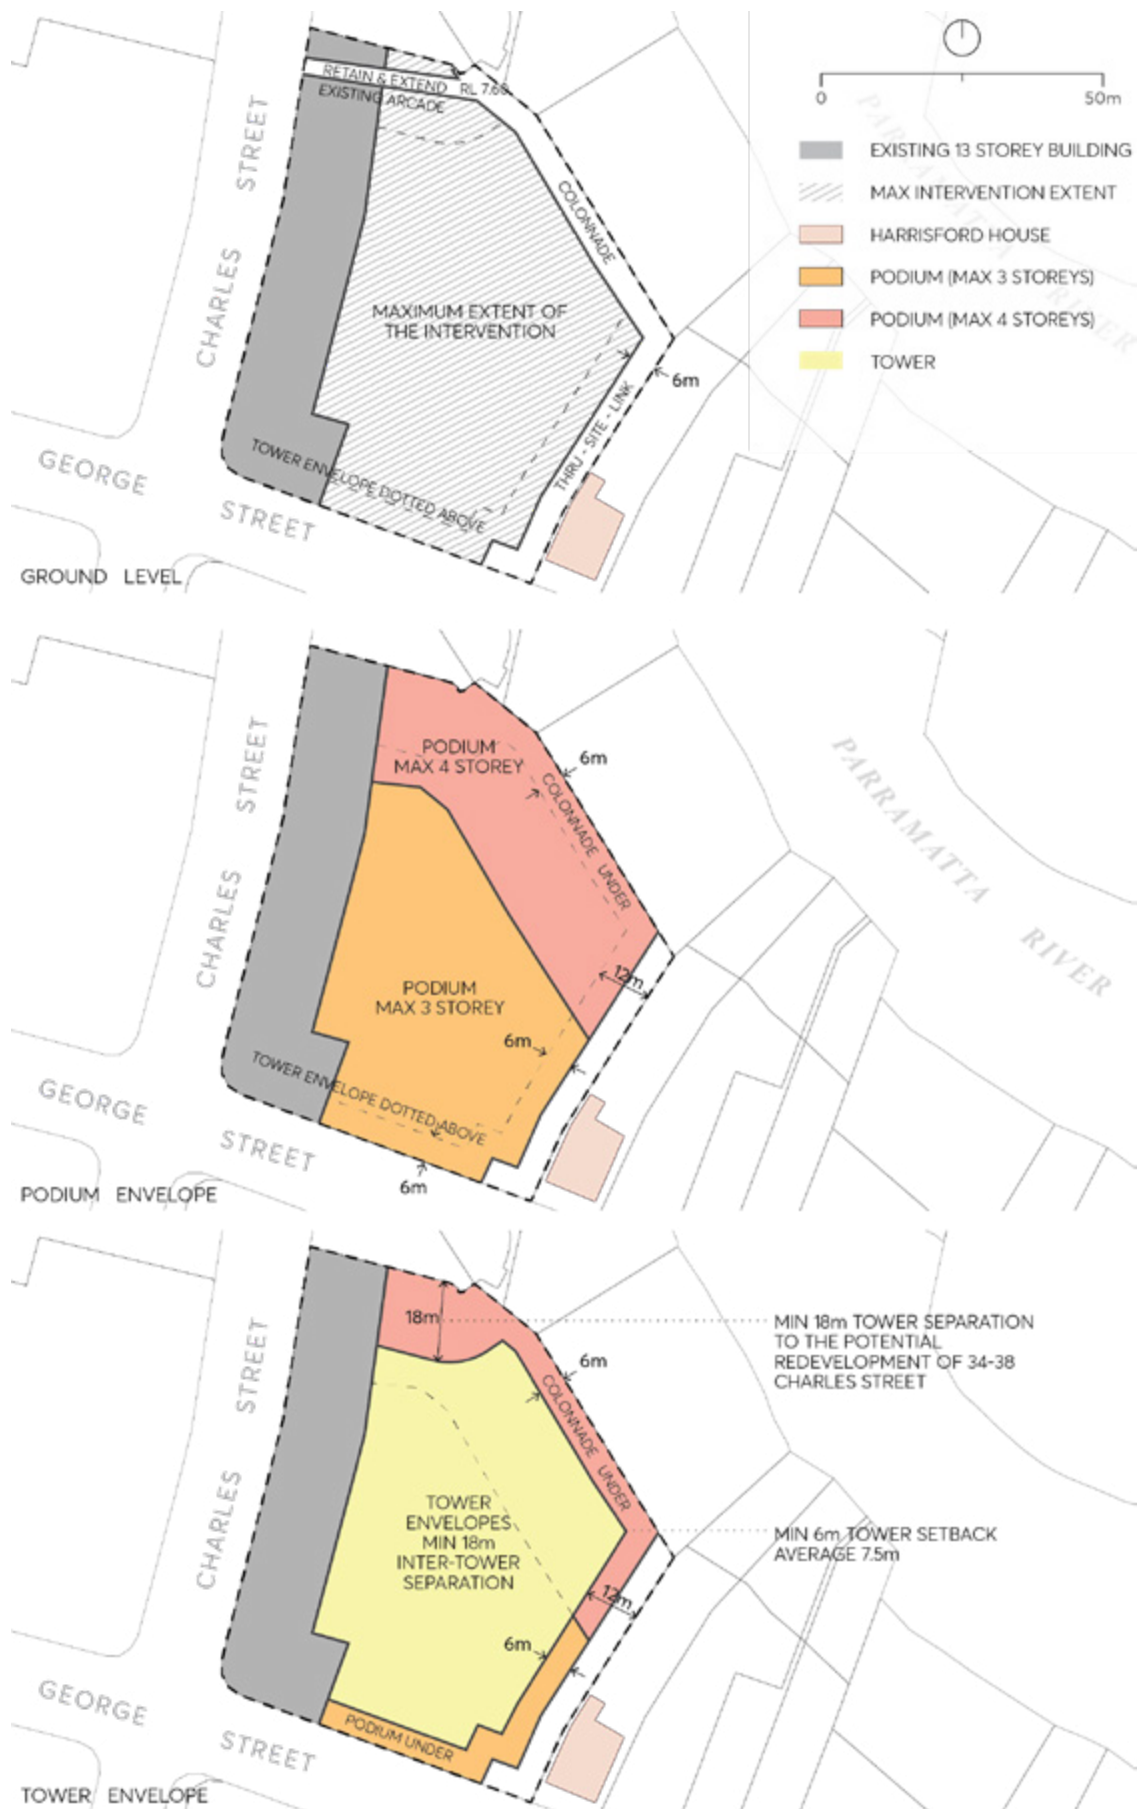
Building heights, setbacks and envelopes
